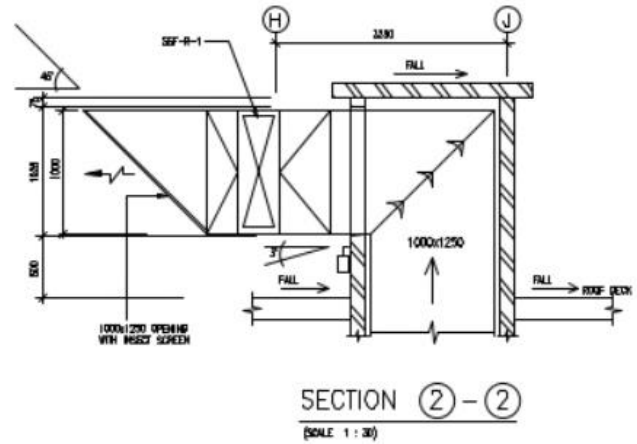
Sectional drawing for smoke Extract Duct in KLPAC
